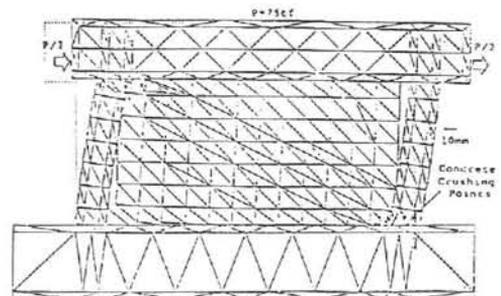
Deformation of Infilled Shear Wall [2-36]
